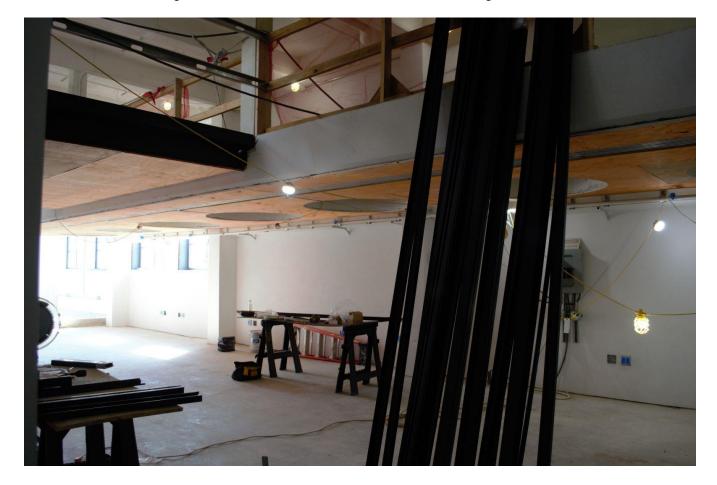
First floor in 1951 addition, looking southeast toward historic freight opening. A second floor is being added in this space.
